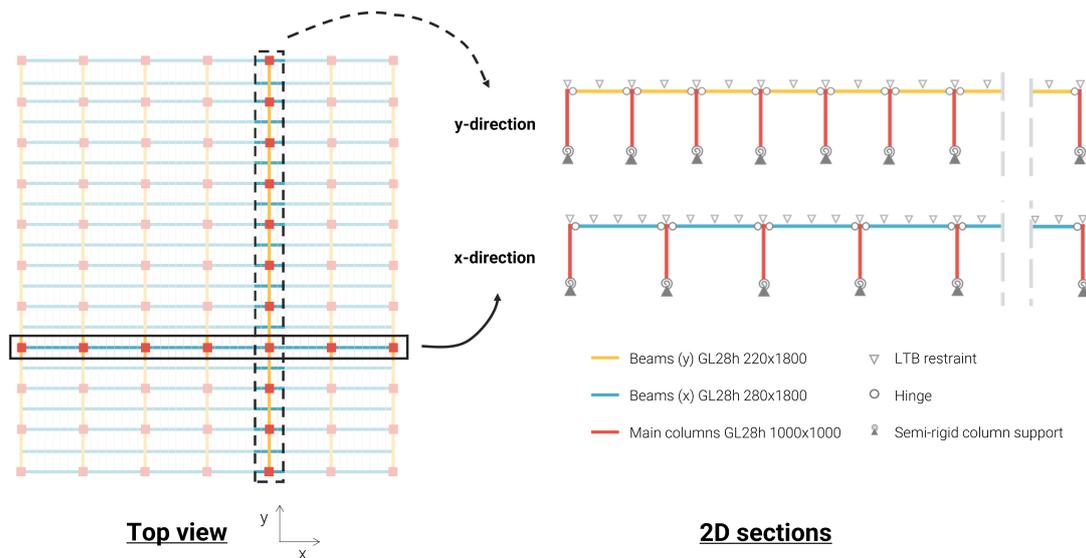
Mechanics scheme of the stabilising frames in the x and y-directions for timber baseline A. Columns and beams are connected by pinned connections in both directions, the stiffness of the column base connection is 110 MNm/rad as calculated in Section C.5.
